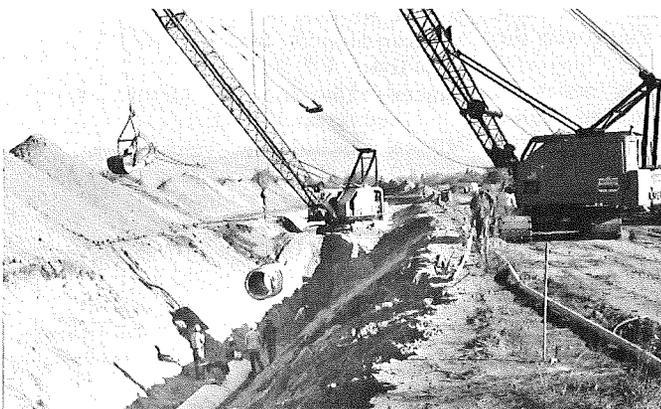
Planting a 40-inch sewer line in soft sediments below Rillito River floodplain surface near north approach to Campbell Ave. bridge. 1973.
